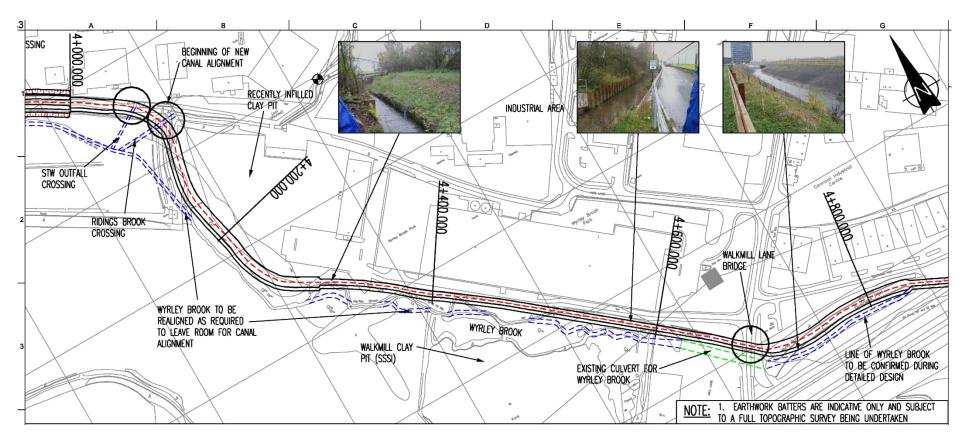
Location of proposed canal route, from Sheet 8 of 16 in Arup (2006)
